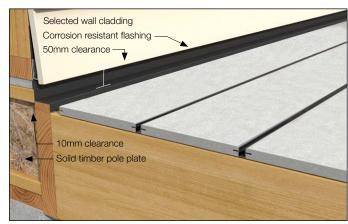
DECK AND BUILDING EDGE TREATMENT
